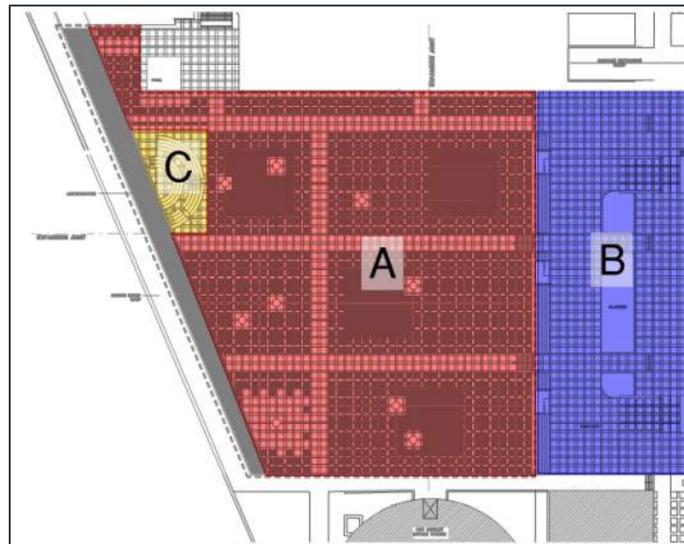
Overall plan of existing Kiley Gardens Plaza above the Rivergate Tower Parking Garage
